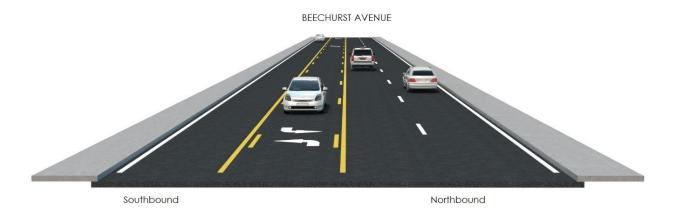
Typical Section (1 Lane SB, 1 Center 2-Way Left Turn Lane, 2 Lanes NB)
